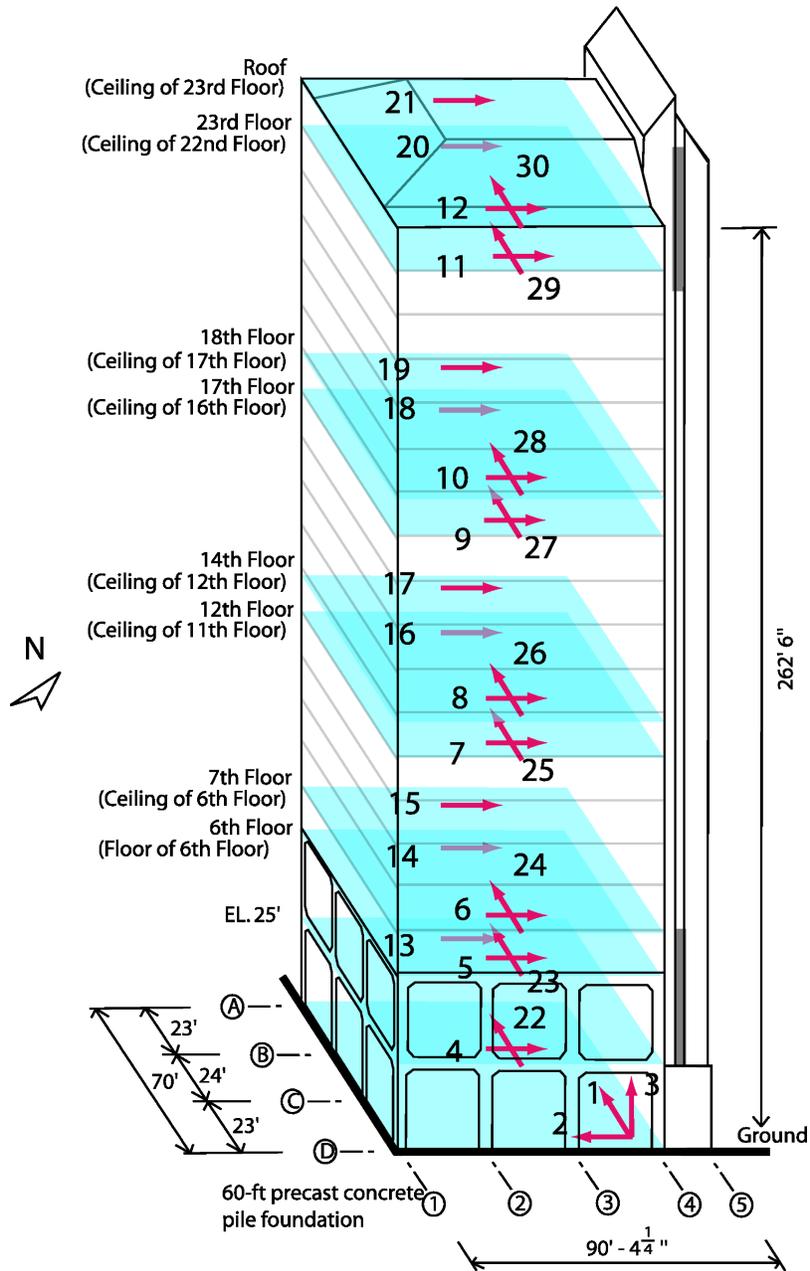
General three-dimensional schematic of the building. Also shown are the 30 accelerometers (heavy arrows) deployed throughout the building.
